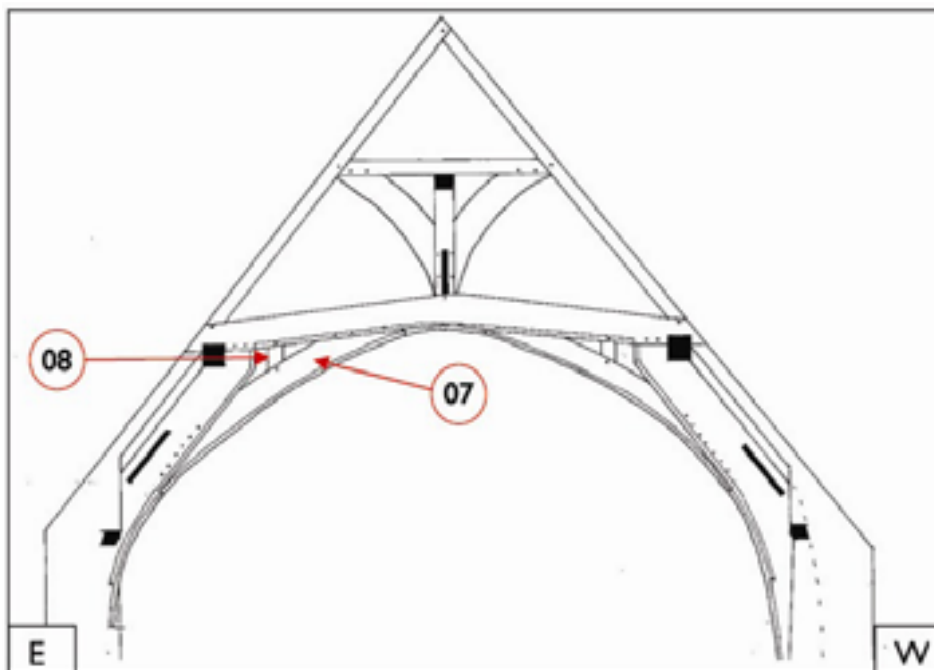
Hall range truss C showing sample locations viewed from the north looking south (based on a drawing provided by N Hill)
